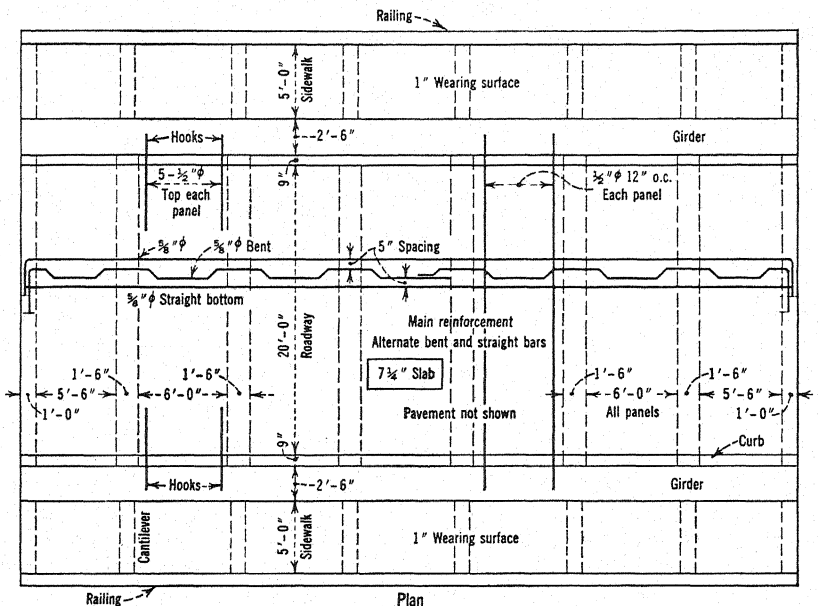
Plan of Through Bridge. (See p. 102.)
